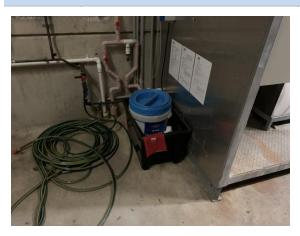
Chemical Storage in North Tower, Level B1, Grey Water Treatment Plant.
